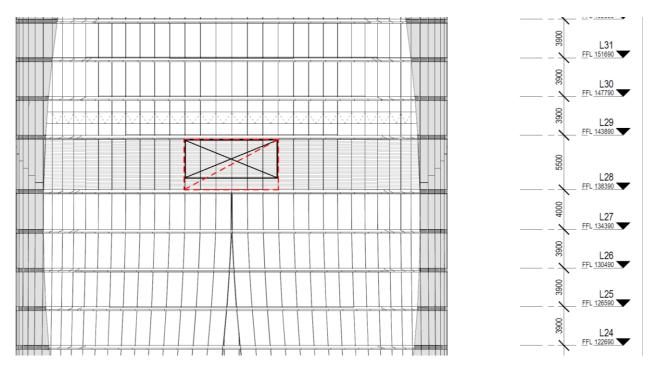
Comparison of approved Level 28 BMU openings (outlined red) and proposed reduced BMU openings (outlined in black) – south elevation Level
